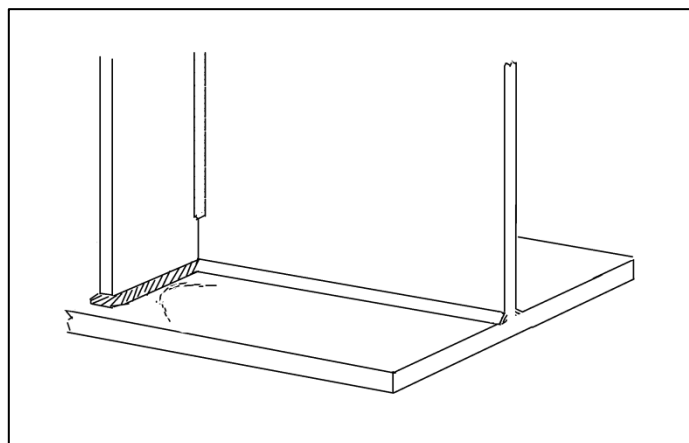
Illustration of fatigue cracking mode D, which is initiated from weld between the vertical stiffener and the flanges.
